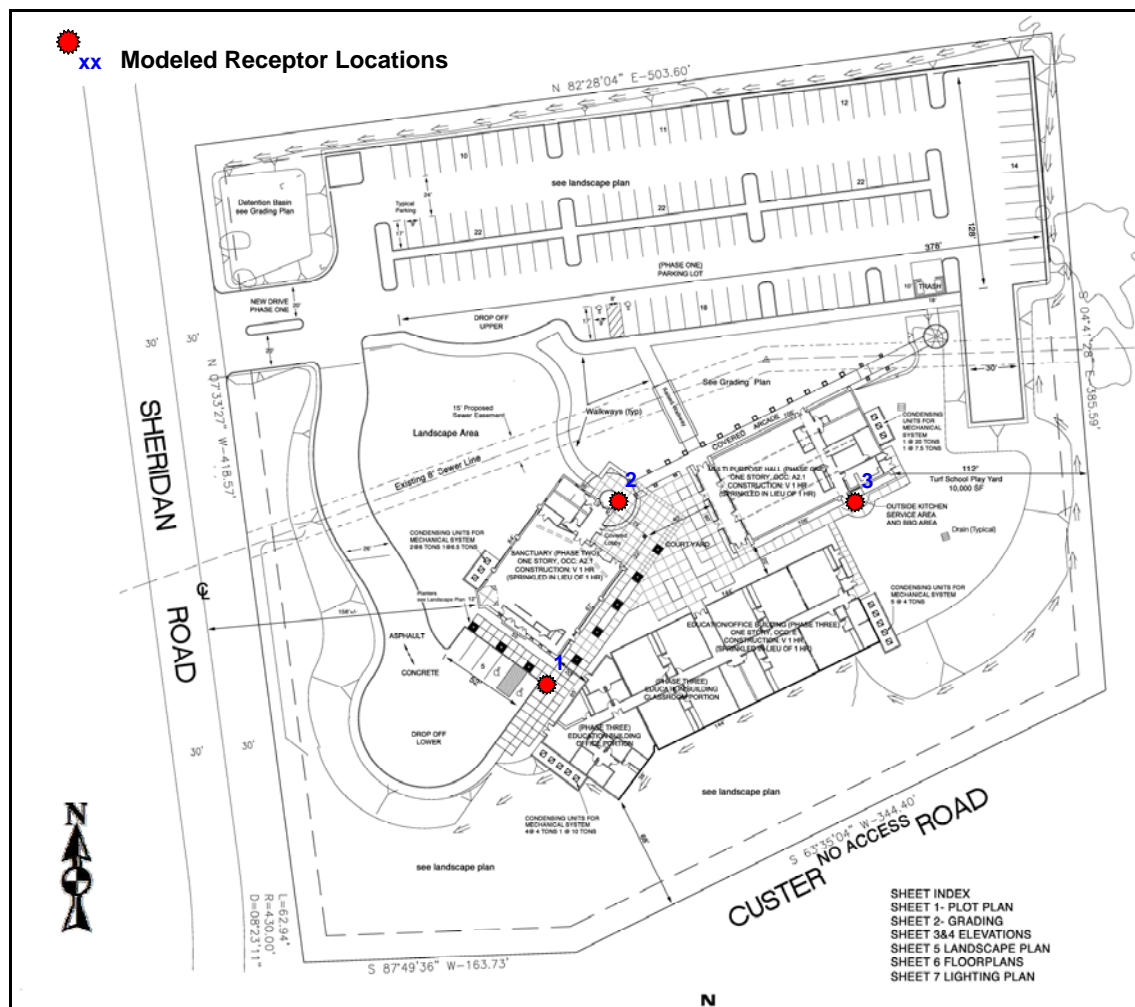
Proposed St. Adelaide Church Site Plan (CCBC Architects, Inc., 11/04)
